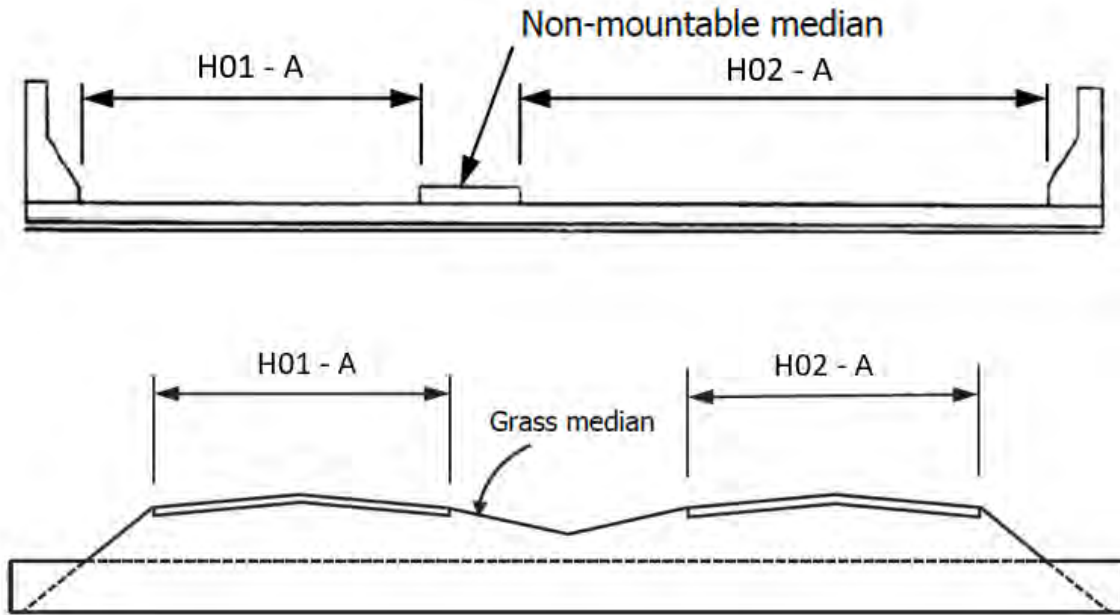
Cross-section view of two highway features carried on a bridge or culvert with various median types
